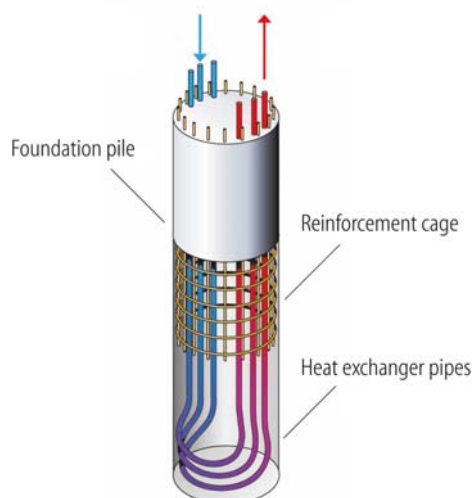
Heat exchanger piles: Earth coupled heat exchanger pipe systems integrated in building foundation piles [04Von2].
